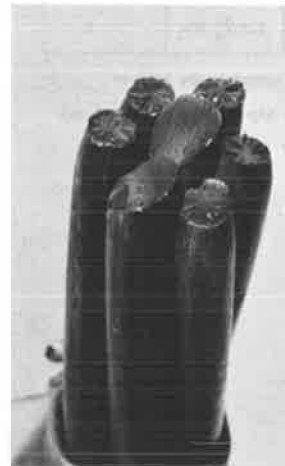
Fatigue and tension fracture surfaces of strands.
